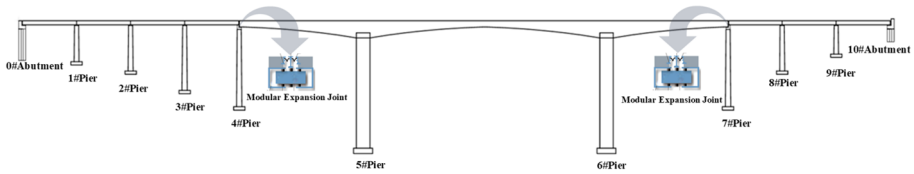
Schematic diagram of the modular expansion joint and overall bridge layout
